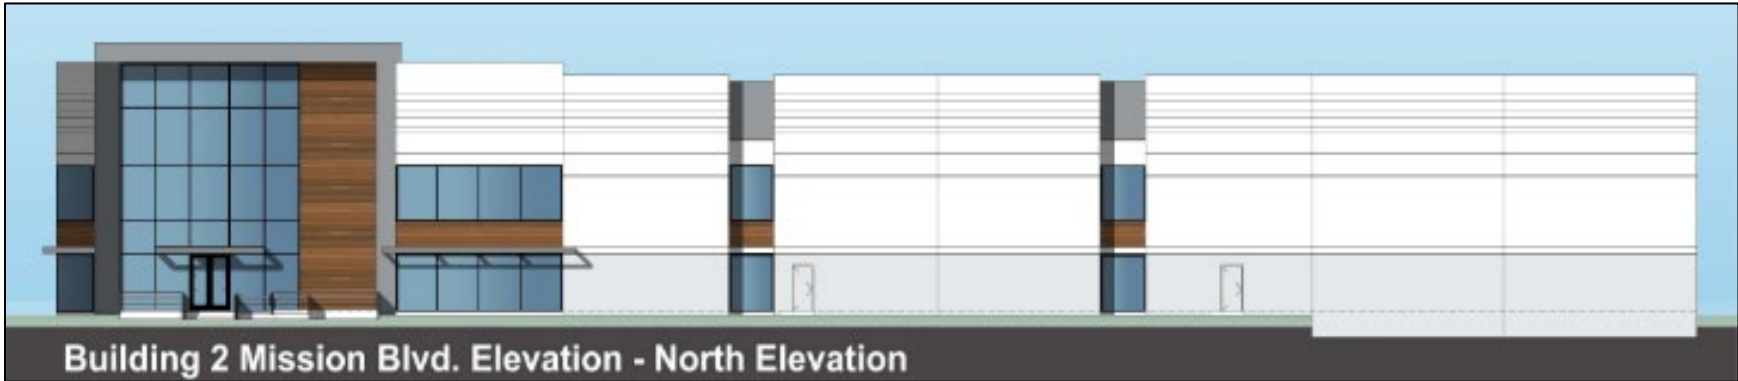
Exhibit D: ELEVATIONS – BUILDING 2 CONTINUED
